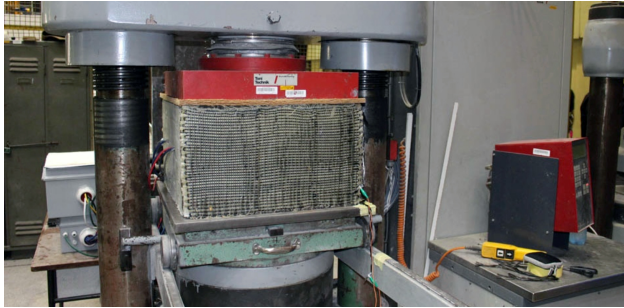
Compressive test on concrete bridge bearing block strengthened with textile sensor.
